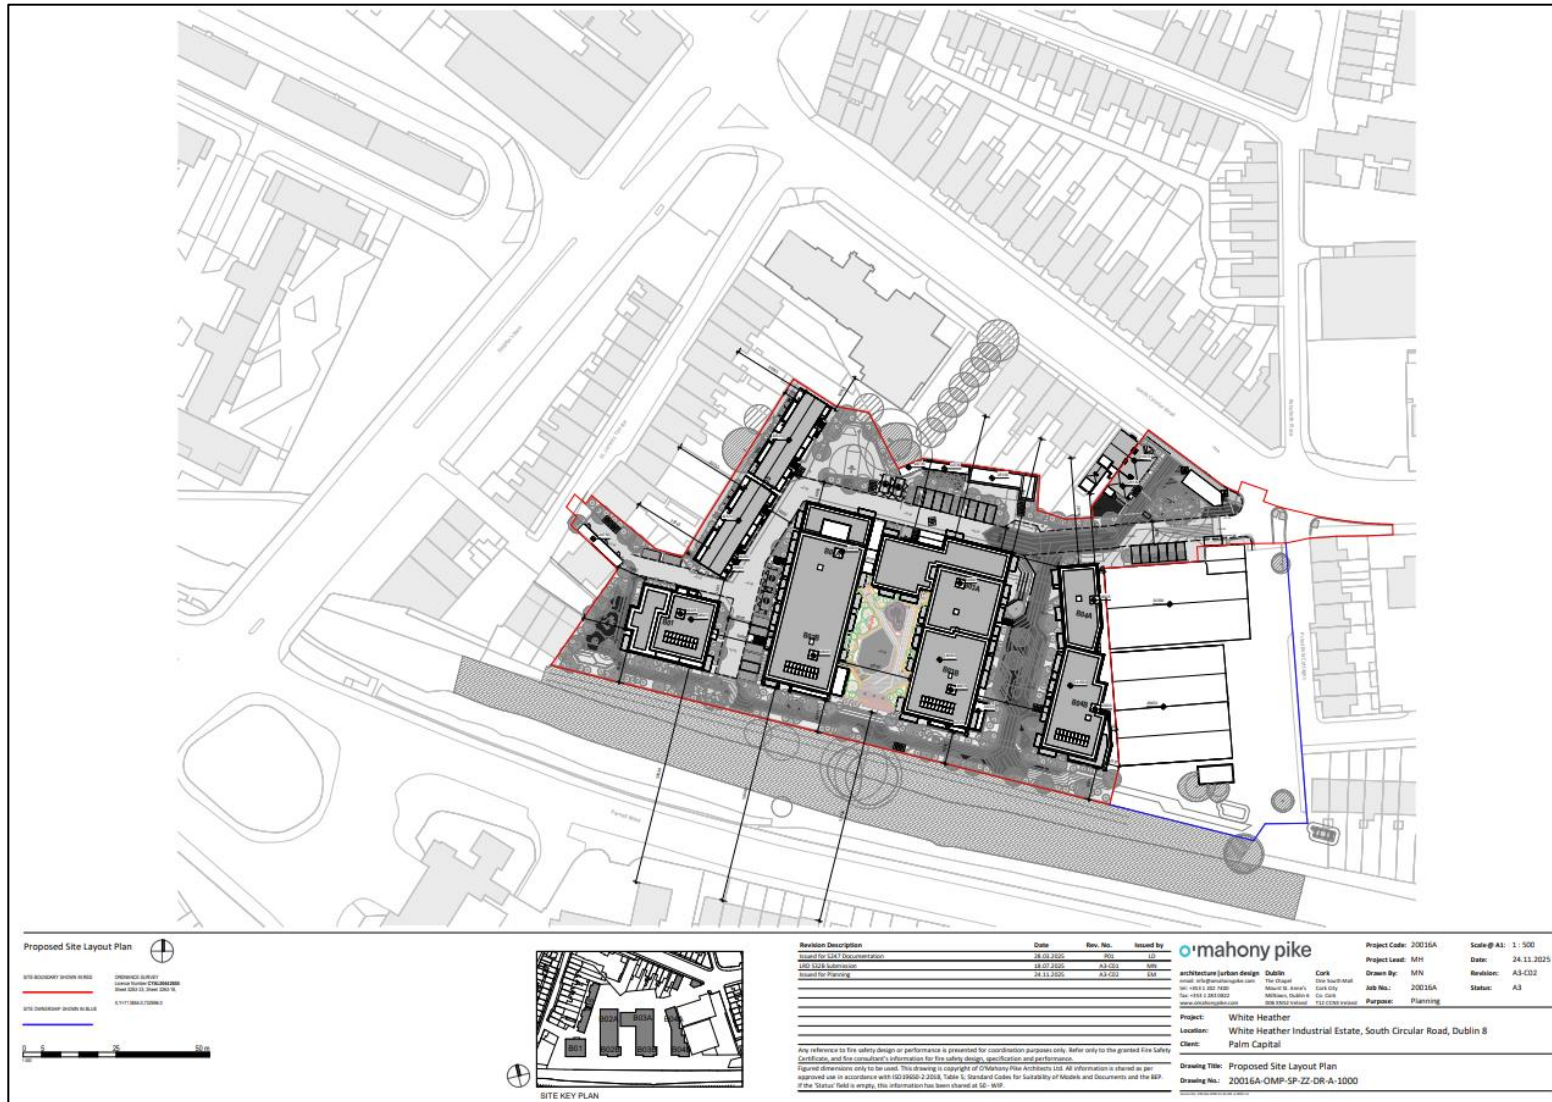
Proposed Site Layout (O'Mahony Pike, 2025)
